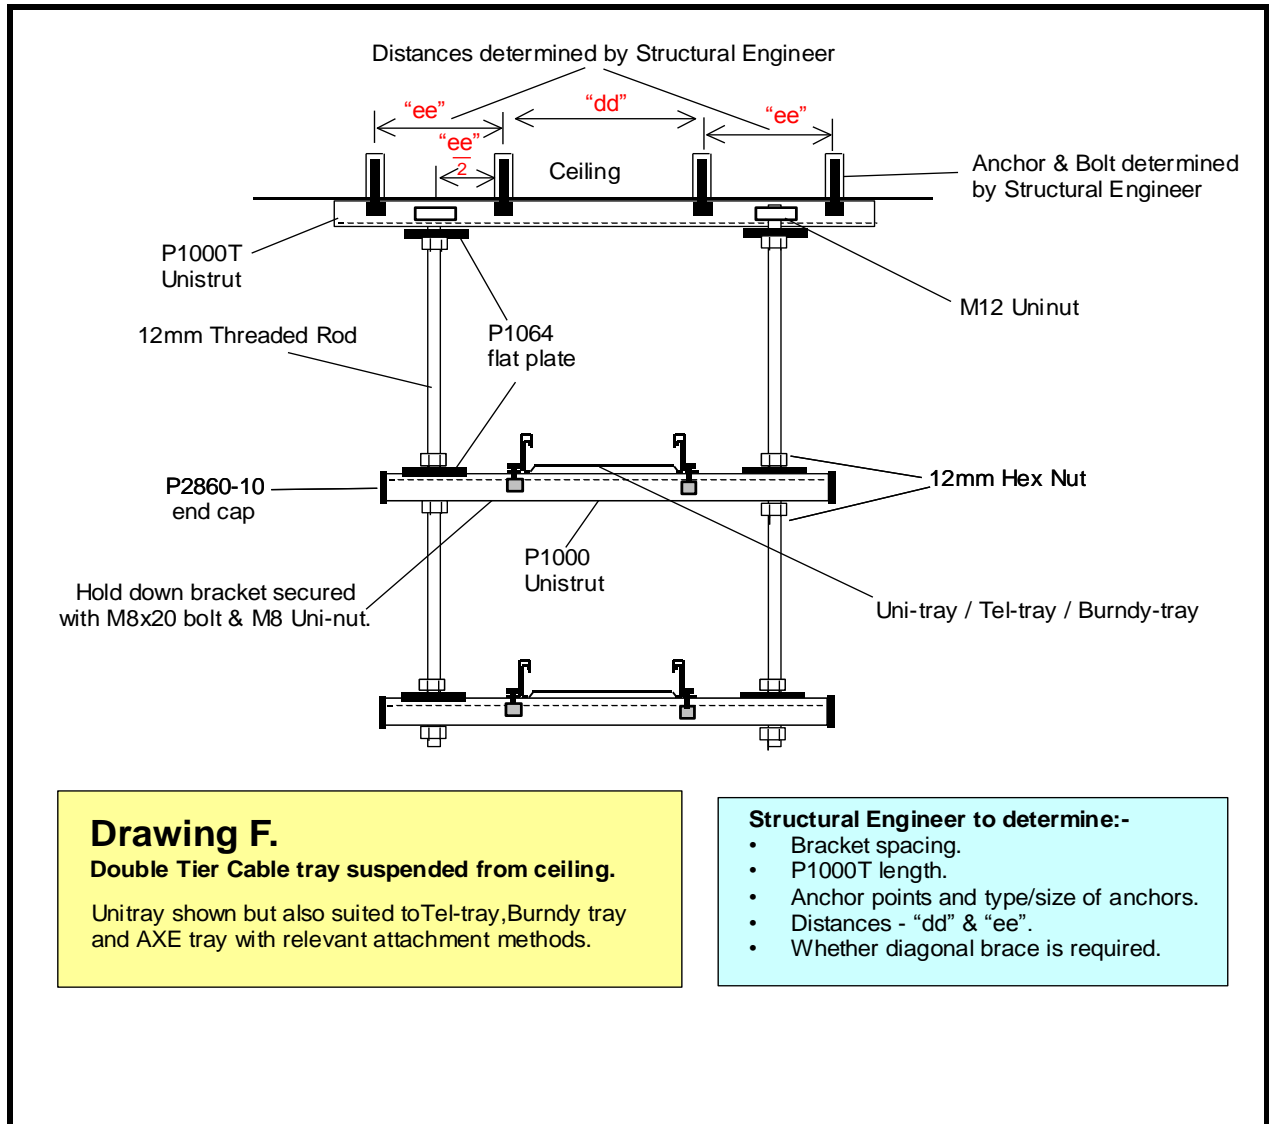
Two Tiers of Tray Suspended from Ceiling
